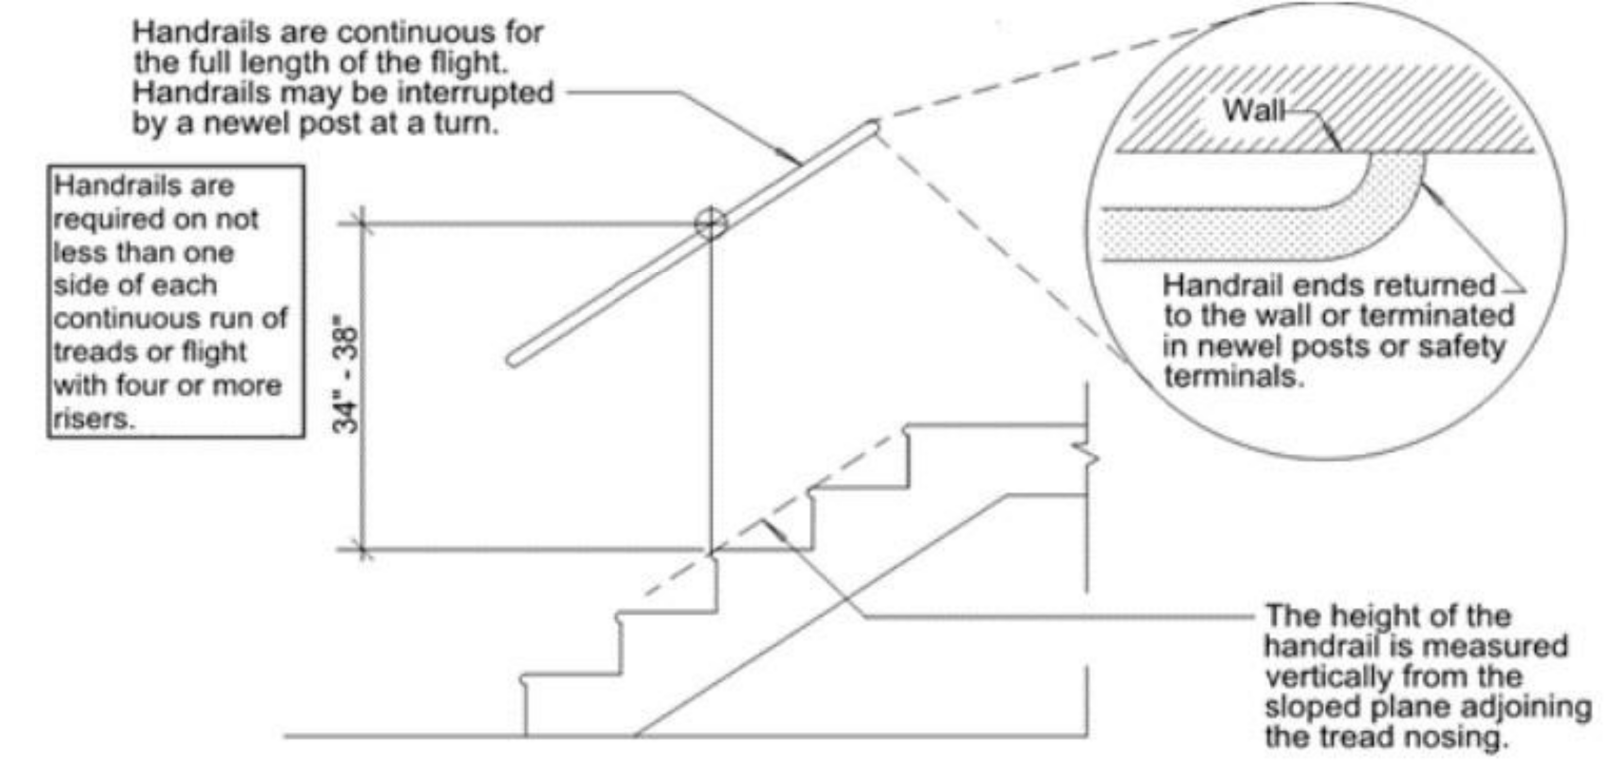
Typical Handrail Elevation (IRC R311.7.8)
